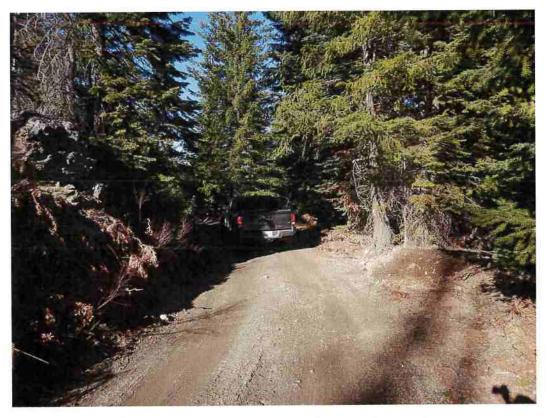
RP 6. Vehicle traveling north, photo taken facing north.
